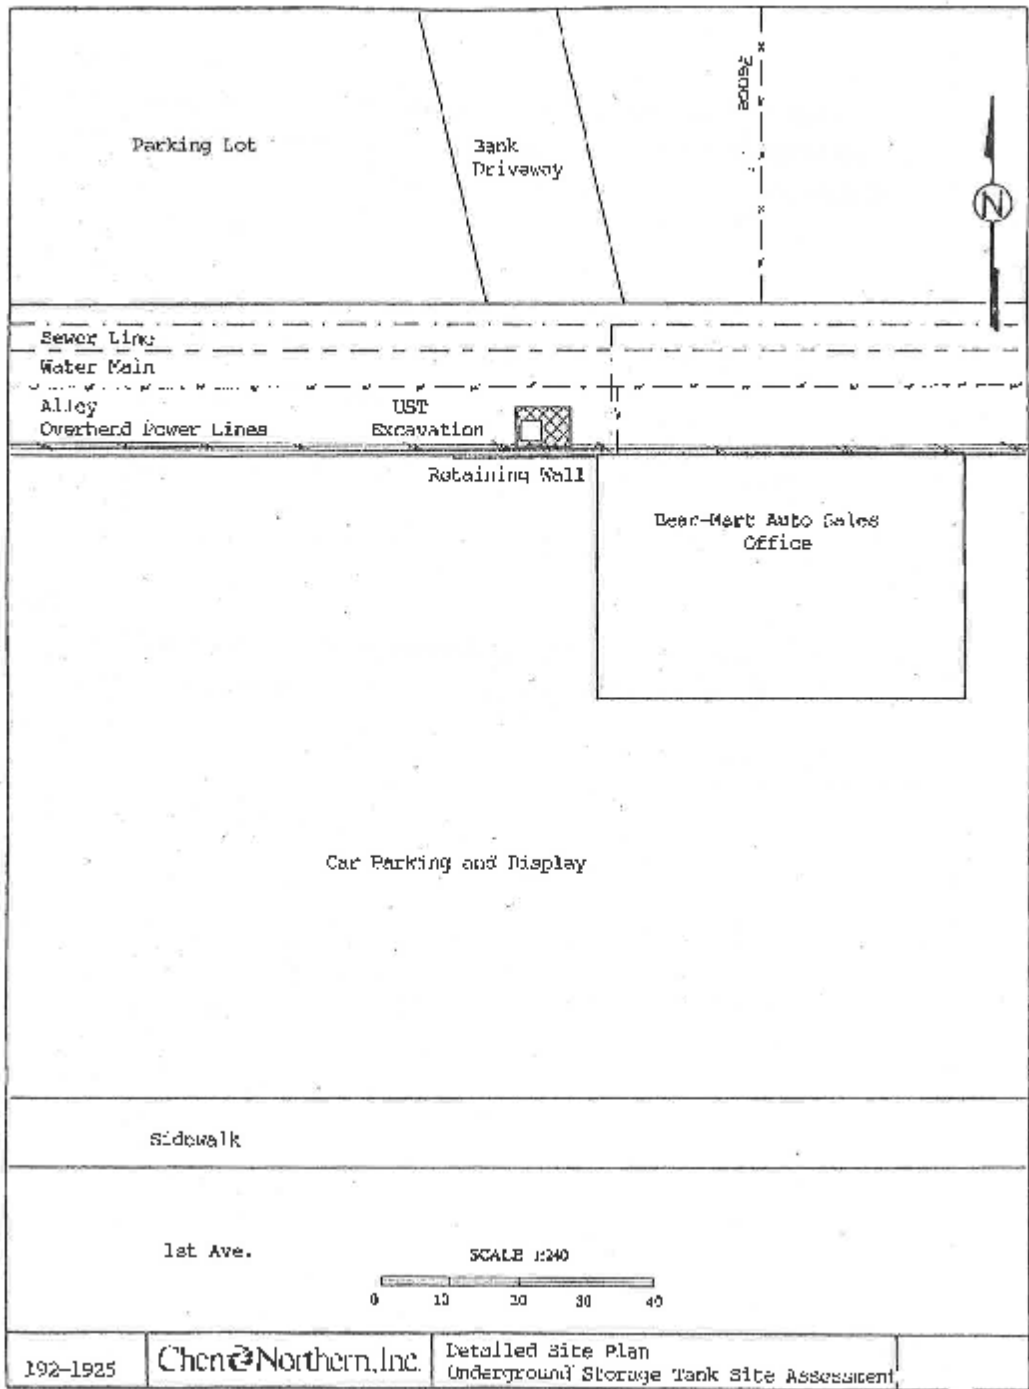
Site Map Showing Underground Storage Tank Excavation Area.
